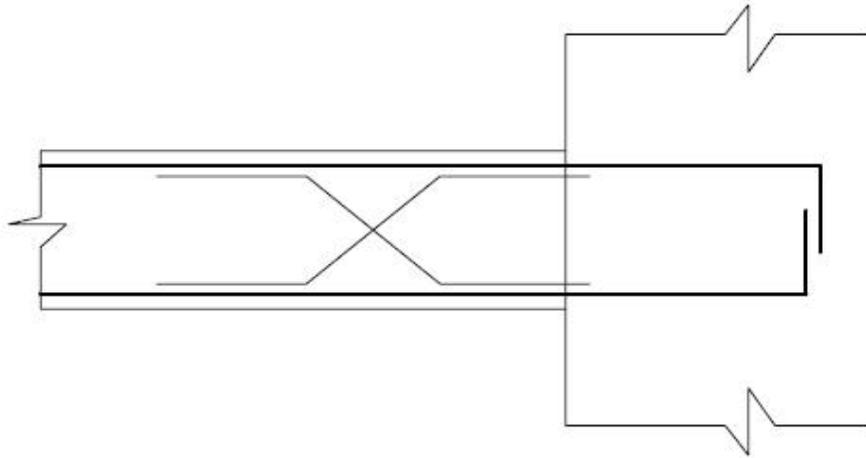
Reinforcement area where is supposed to form plastic hinges.
